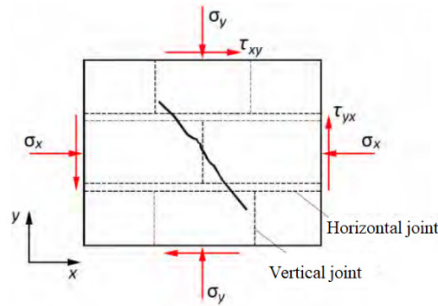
Mechanism of diagonal cracks (Source: Baballeku,2014)
